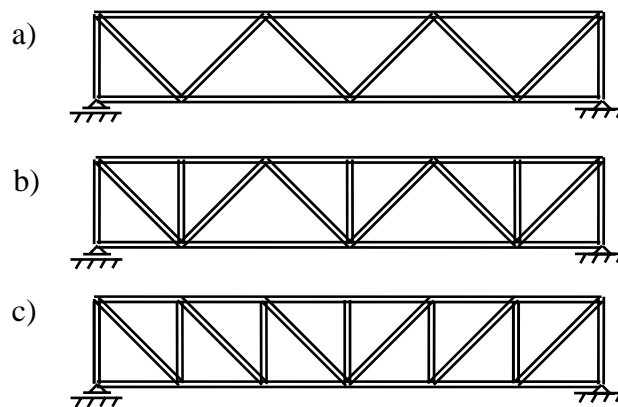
Typical tubular trusses: a) Warren truss with K-joints, b) modified Warren truss with KT-joints and c) Pratt truss with N-joints.
